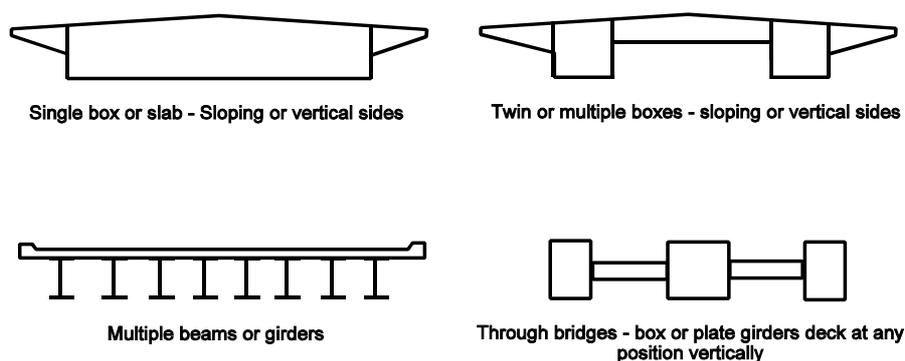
Typical bridge cross-sections to which Figure 3.8 applies
